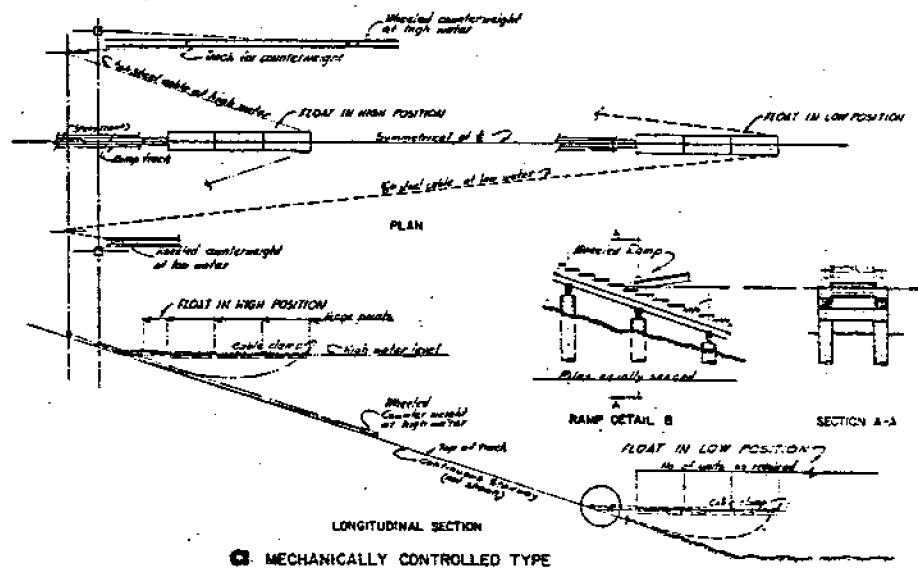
Drawdown Adjustable Anchorage (Chaney, 1961, p. 142)
